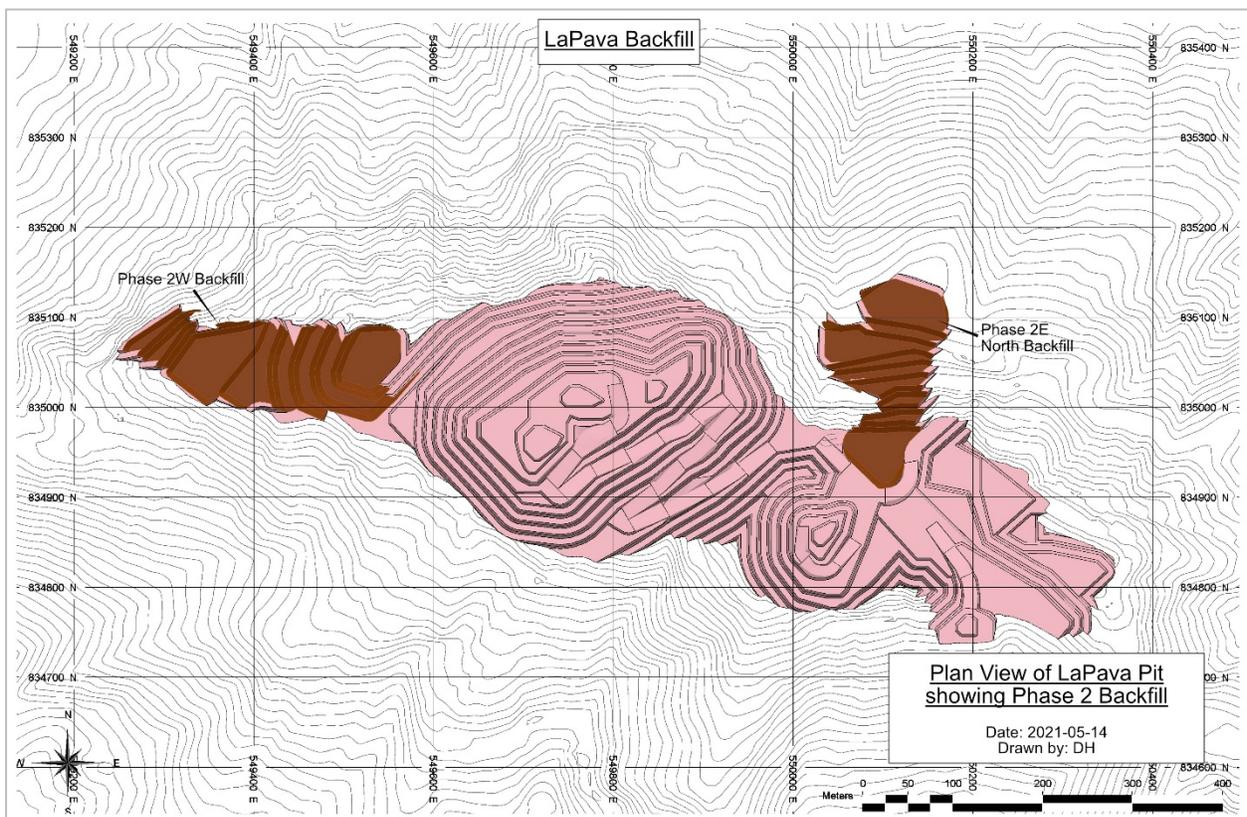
La Pava Backfill Shapes (MMTS, 2021)
